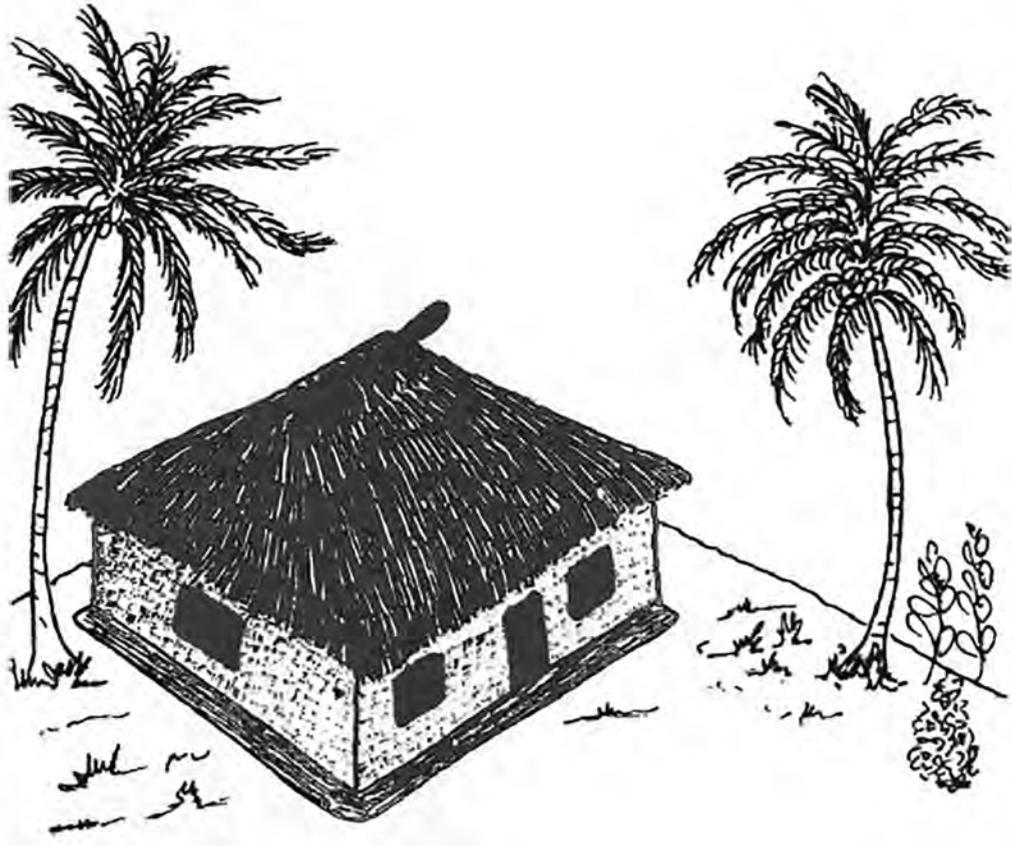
BUILD YOUR HOUSE ON A FIRM SITE
